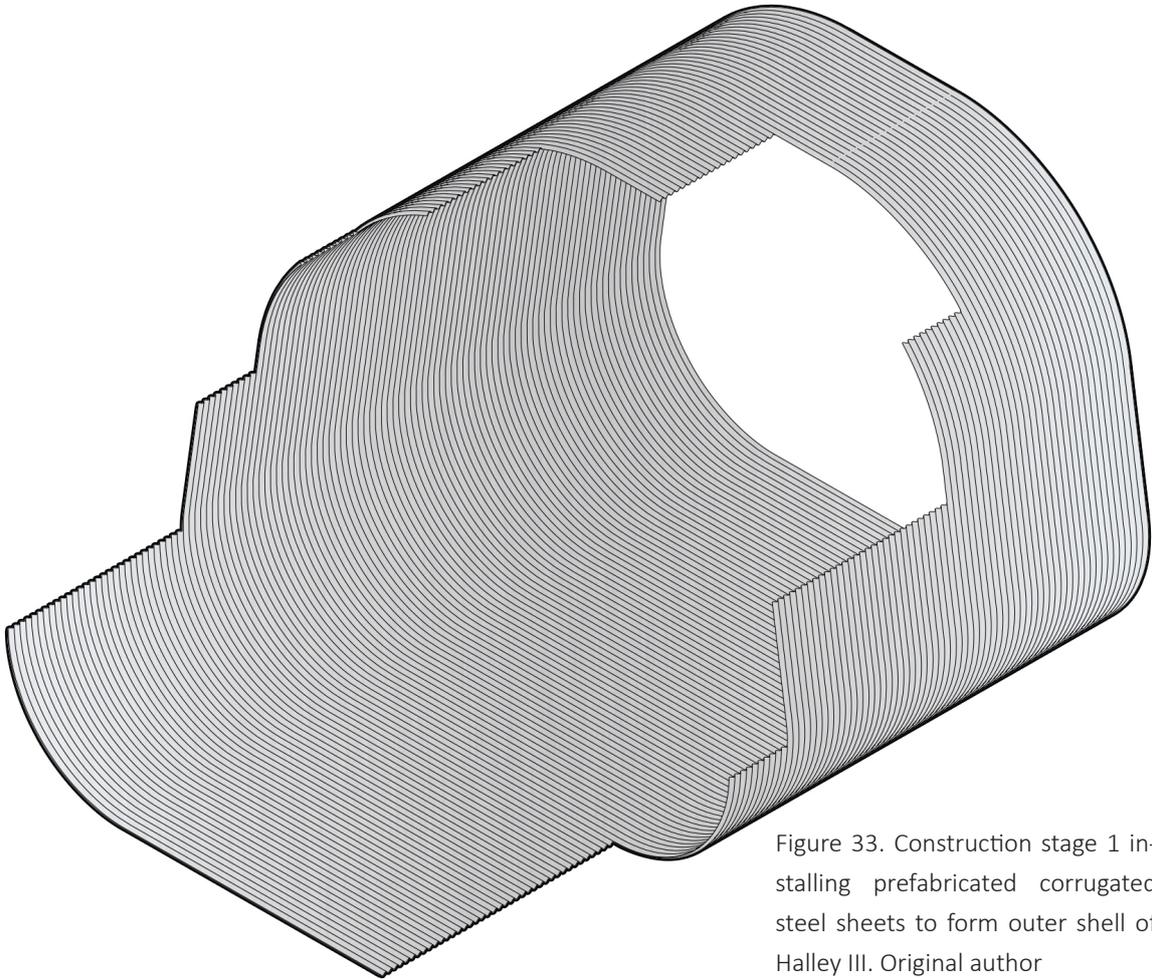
Construction stage 1 installing prefabricated corrugated steel sheets to form outer shell of Halley III. Original author
